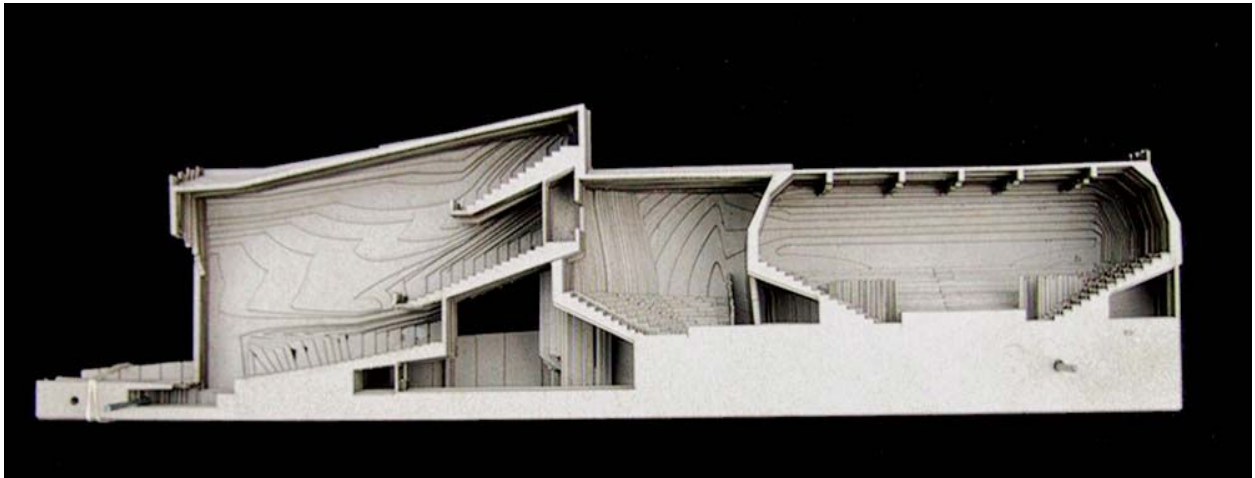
Laser cut cardboard model of the section of the Performing Arts Center
